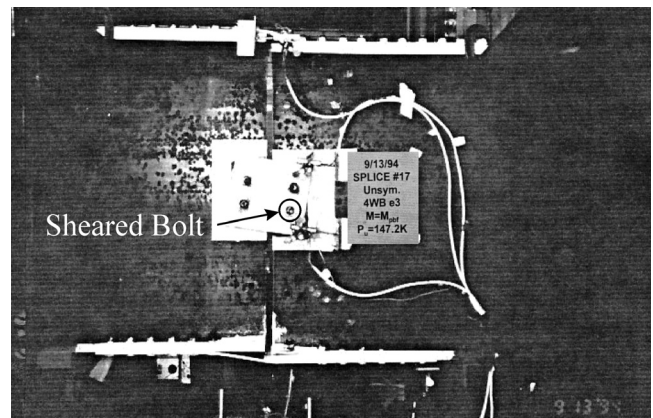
Typical failed unsymmetric beam splice with undeveloped flange plates (splice 17u).
